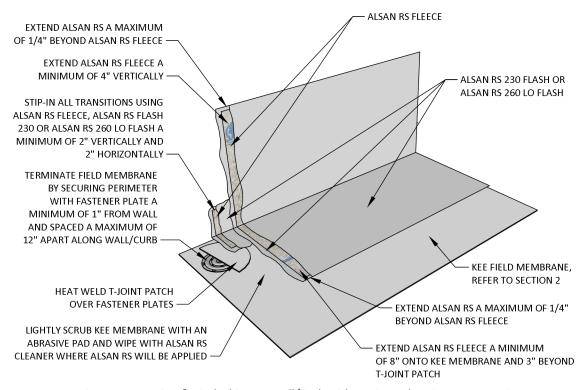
ALSAN® RS Flashing at Wall/Curb with Horizontal Perimeter Fastening
